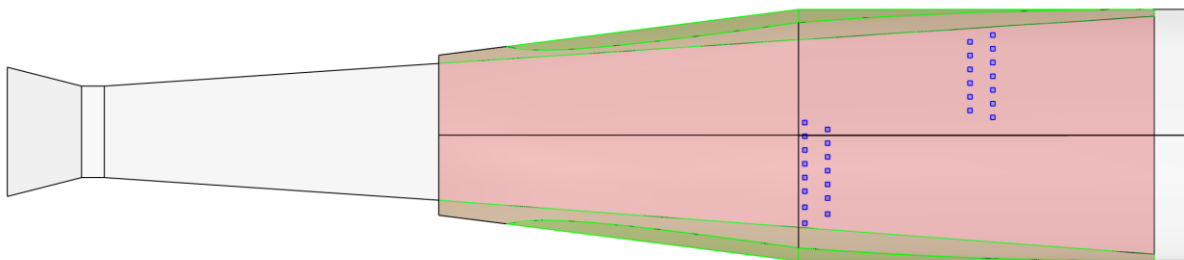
Side walls as diffuser extension in addition to bottom ramp plus double row squared calming piles with 20/20 cm distance 40 cm, plan view
